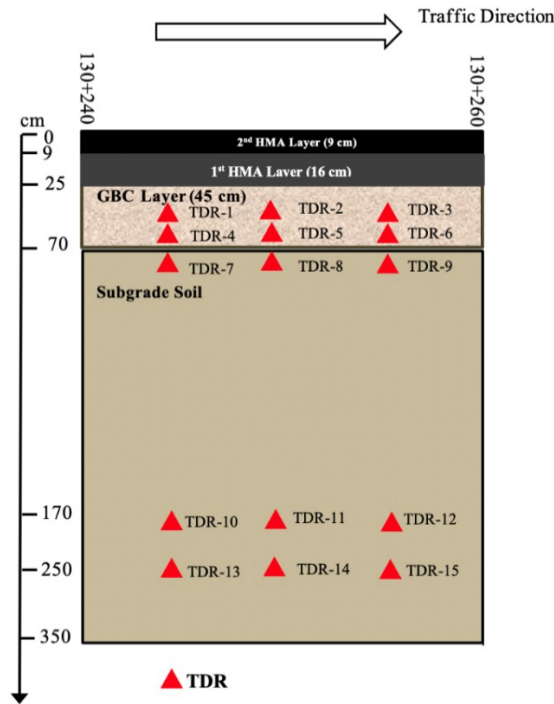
IRRF test road pavement structure, showing the location of TDRs embedded in the GBC and subgrade layers
